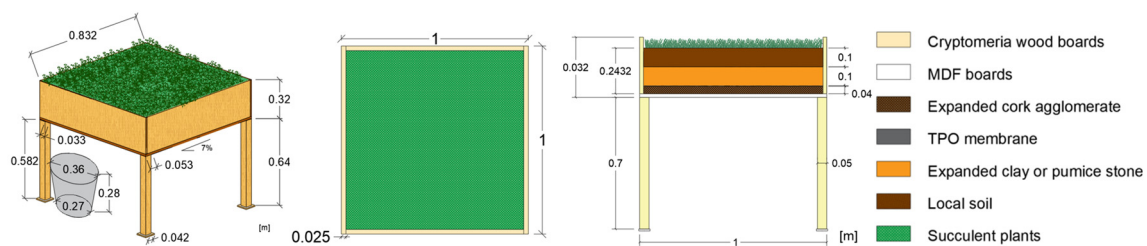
Schematic representation of the prototypes, with the materials and dimensions of their components.
